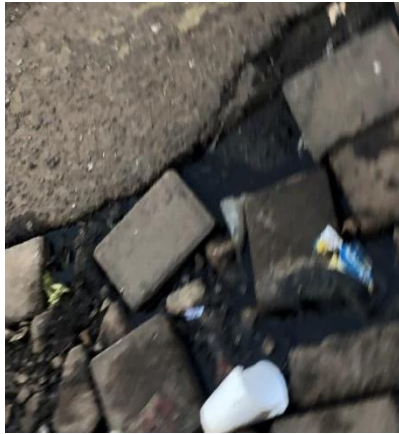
Grey water and damaged pavement (Author, 2024)
